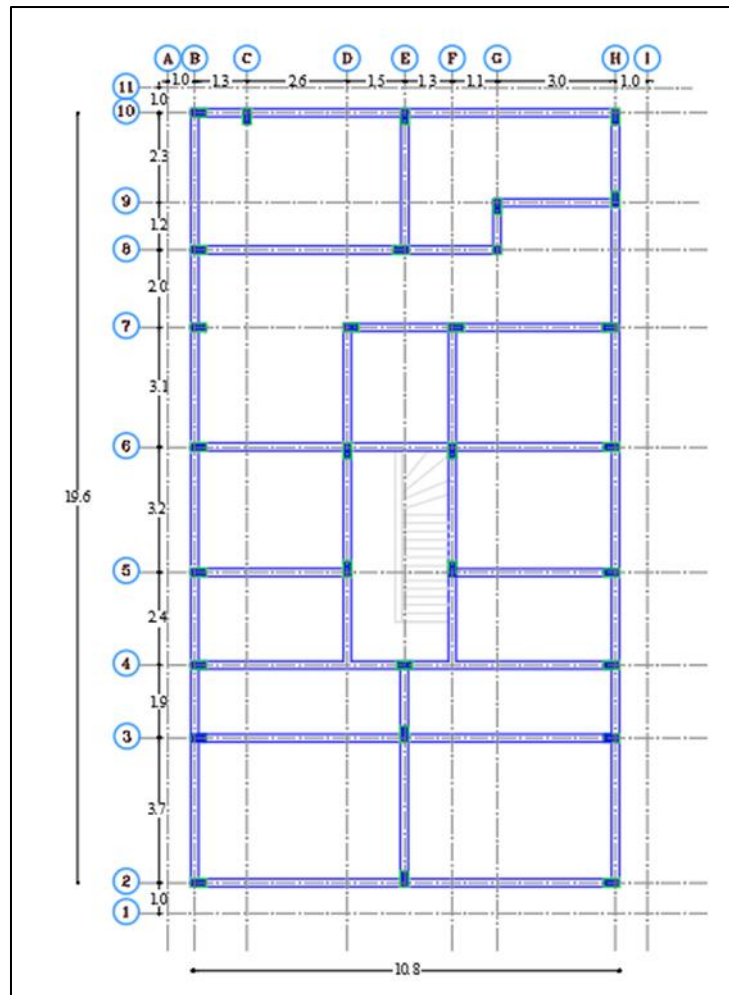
Typical Floor Layout Showing Beam and Column Configuration (in meters)
